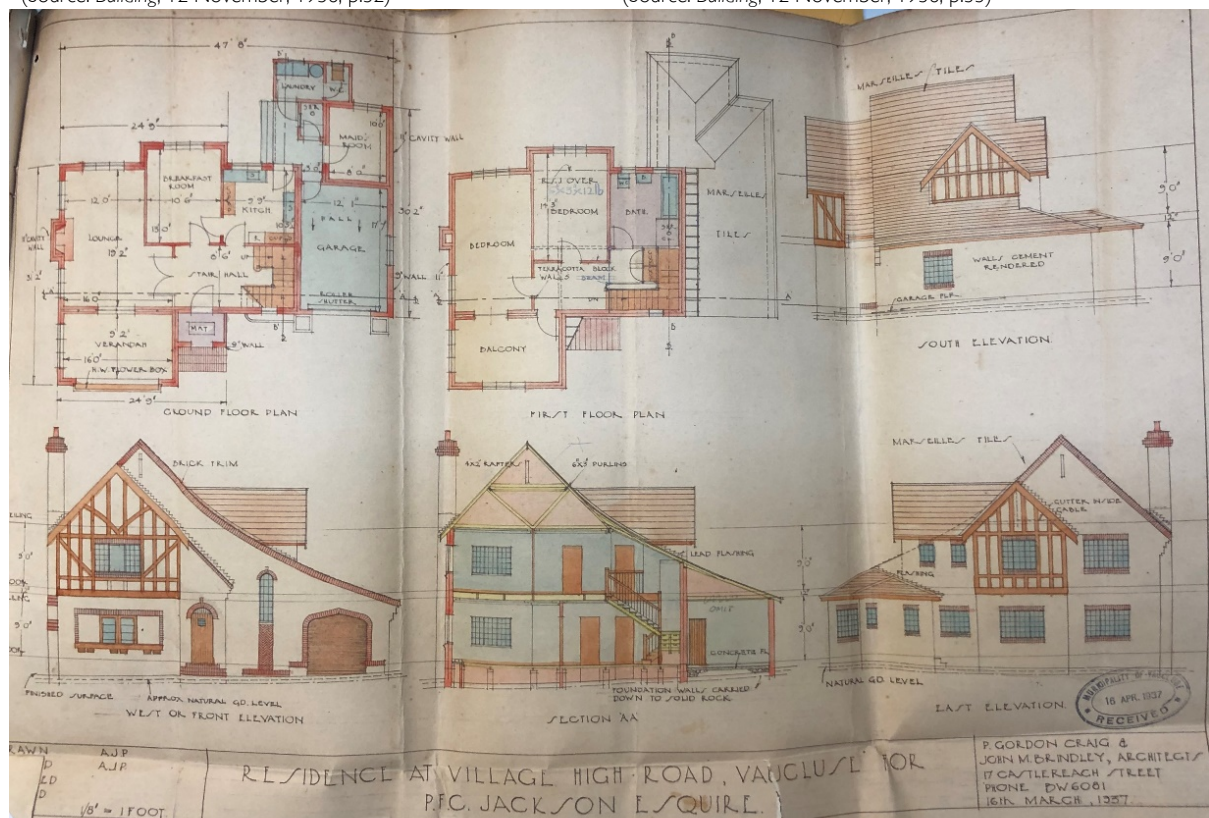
P.F.C. Jackson House, 65 Village High Road, Vaucluse, 1937. Architect: P. Gordon Craig & John M. Brindley
